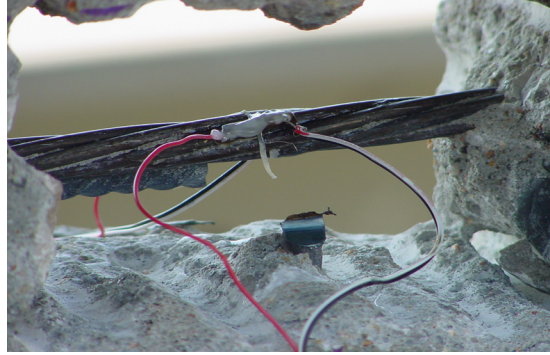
Placement of strain gage on exposed prestressing strand.
